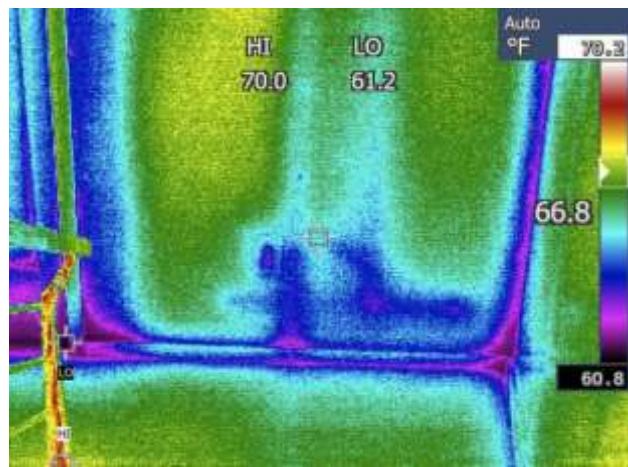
P1 thermal bridge at “strong wall” downstairs
